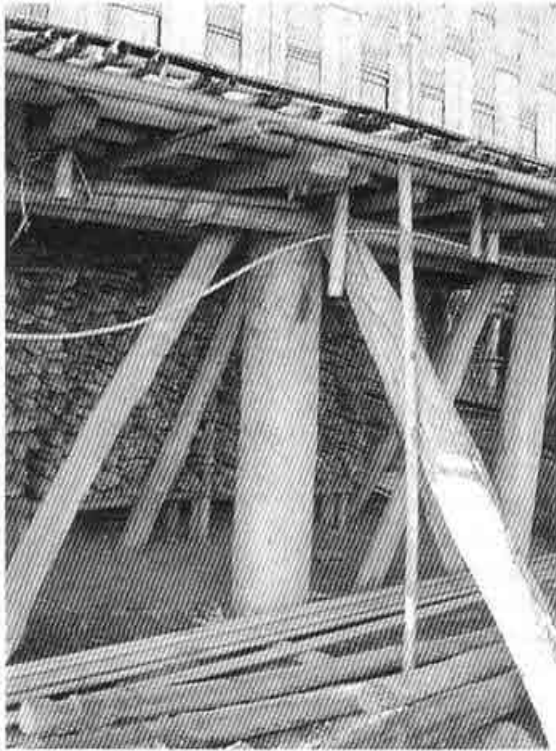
Stilt construction in wood. Hardwood trees with barks removed are used as posts. Bandarban 2003; photo: authors.
